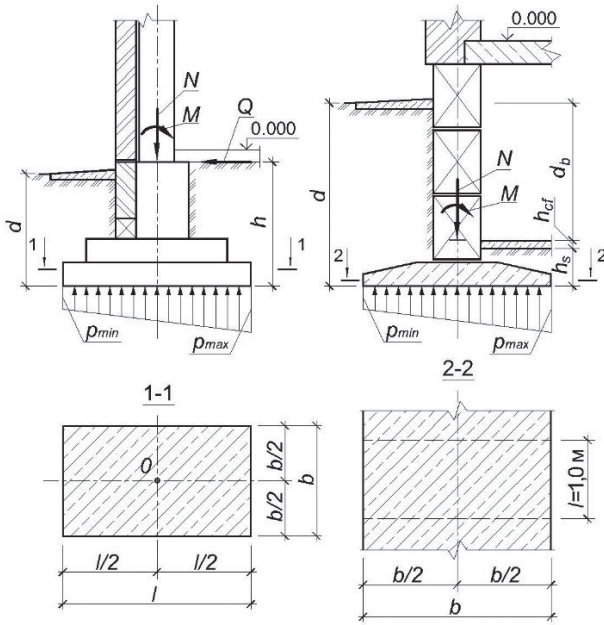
Design diagrams of the projected foundations of reconstructed buildings: a – a free-standing foundation for a building without a basement; b – strip foundation for a building with a basement; $p_{\max}$, $p_{\min}$ – respectively, the maximum and minimum pressure on the base of the foundation, kPa; l , b – respectively, the length and width of the base of the foundation, m; d – foundation depth, m; h – foundation height, m; Q , N , M – loads acting on the foundation; h_s – thickness of the soil layer above the foot of the foundation from the basement side, m; h_{cf} – basement floor structure thickness, m; d_b – basement depth, m
